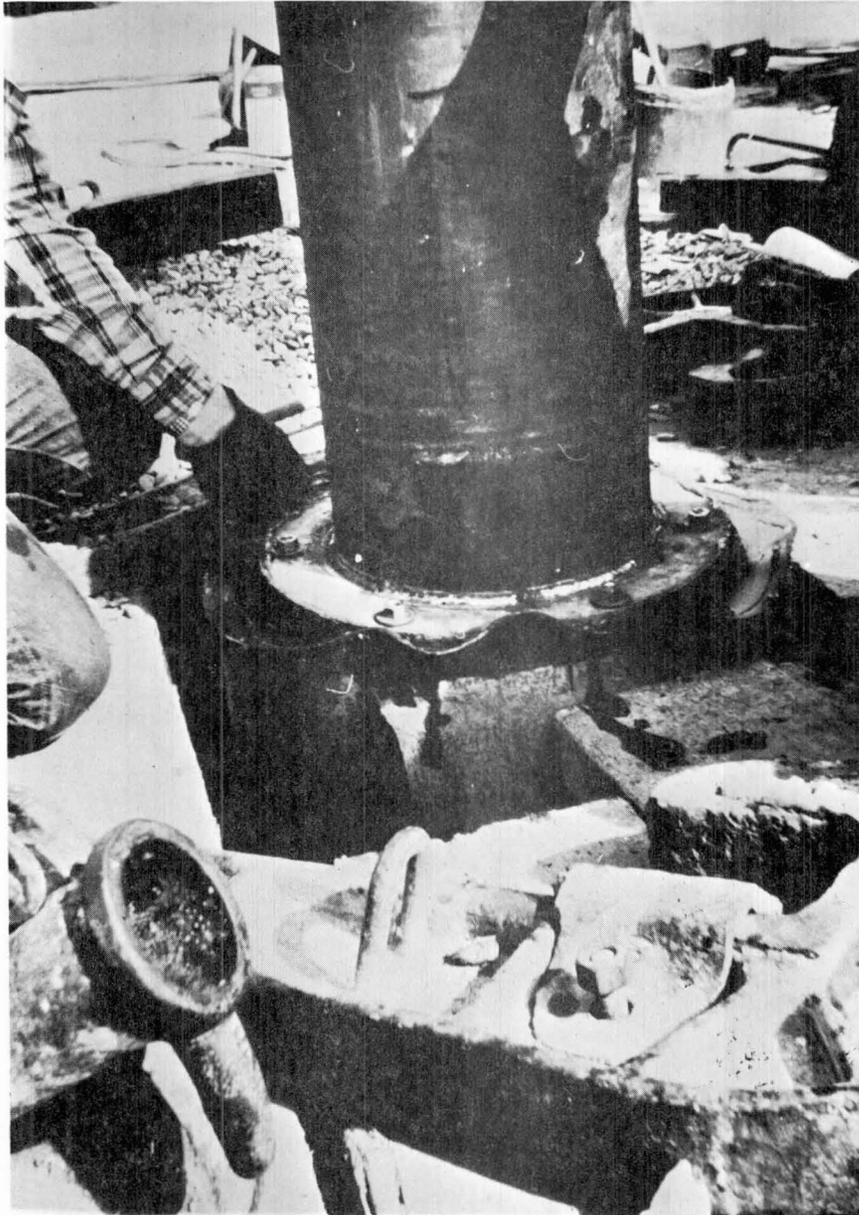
LINER AND PACKER ASSEMBLY BEING INSTALLED IN RECHARGE WELL
